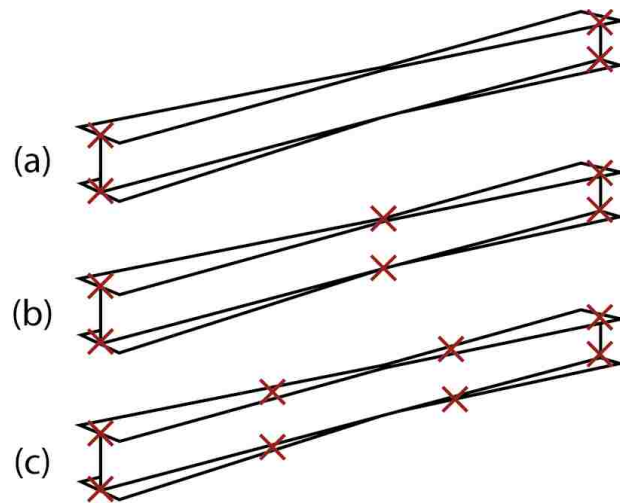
Tapered-Flange Beams with (a) No Bracing, (b) Mid-Span Bracing, and (c) Third-Span Bracing
